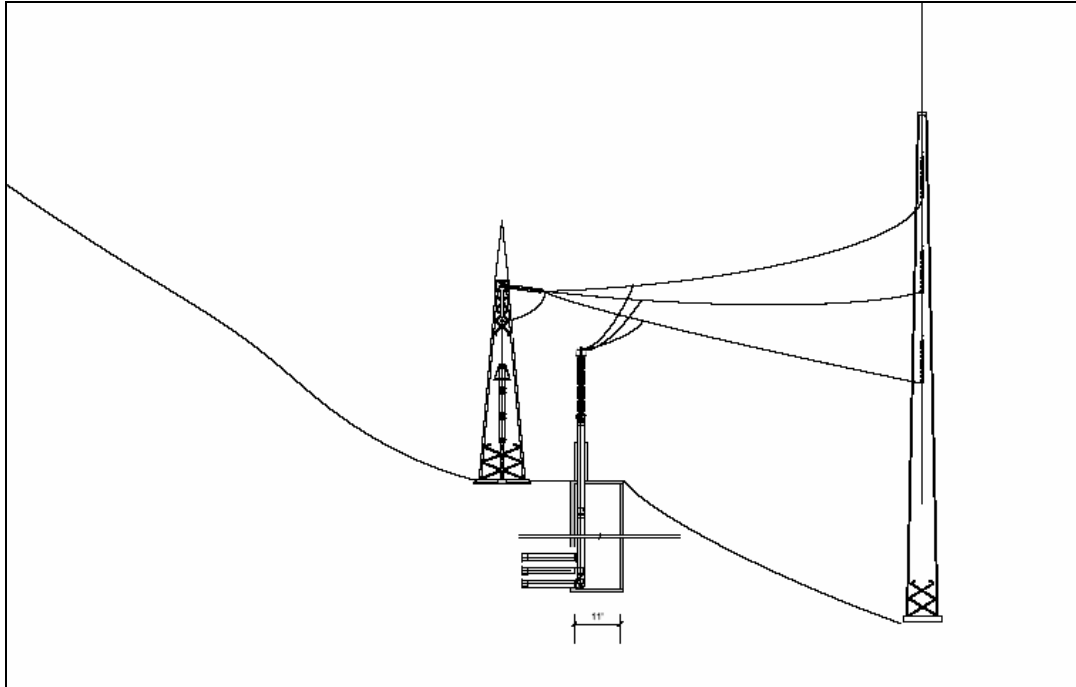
Alternative 8 Elevation (2 of 2)
